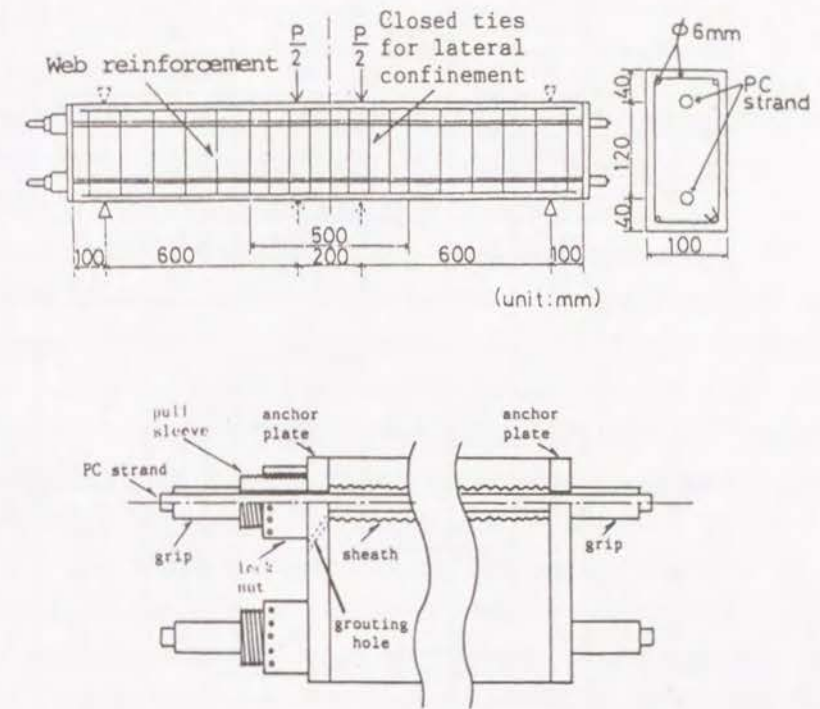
Dimensions of Series-E beams and details of its anchorage zone
